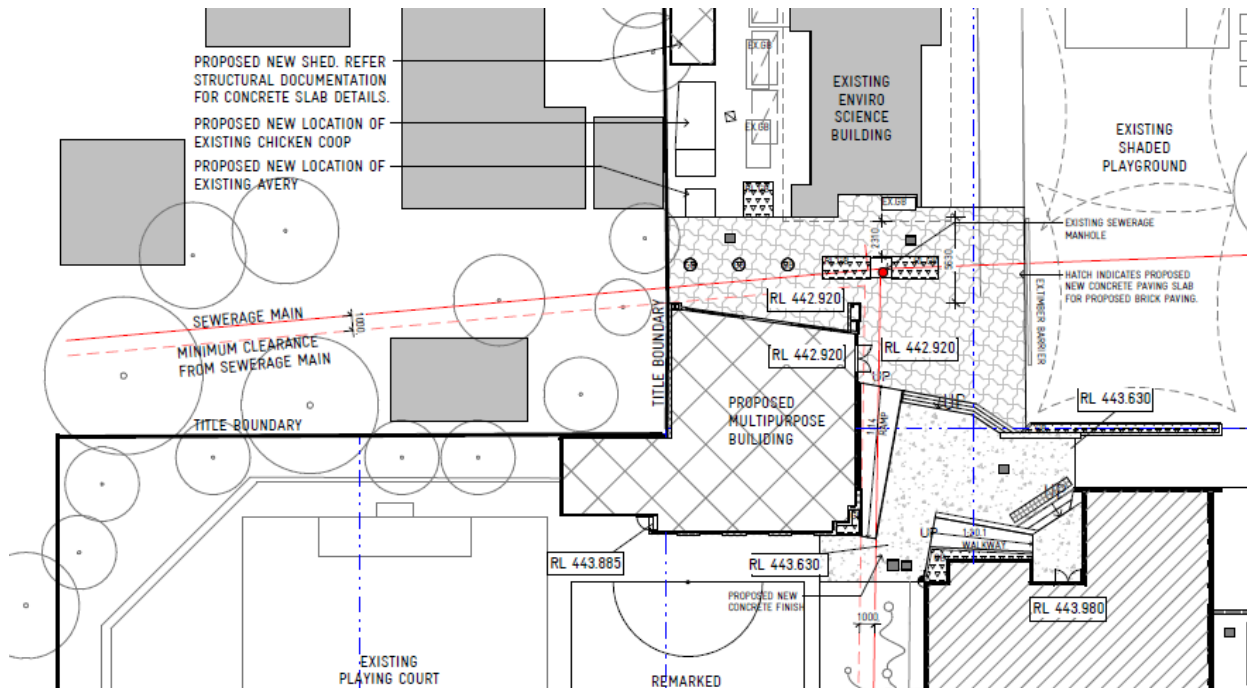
Location of proposed multipurpose building, St. Patrick's Parish Primary School. (Y2 Architecture, March, 2021).
